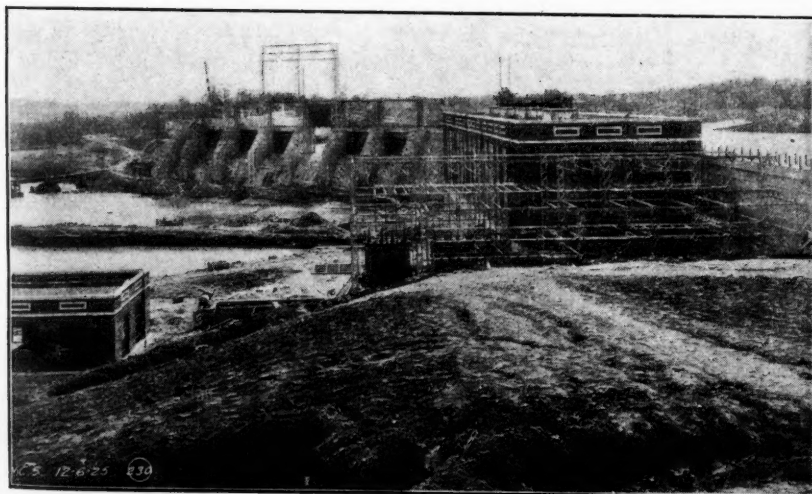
GENERAL VIEW OF NEW CATAWBA STATION.
